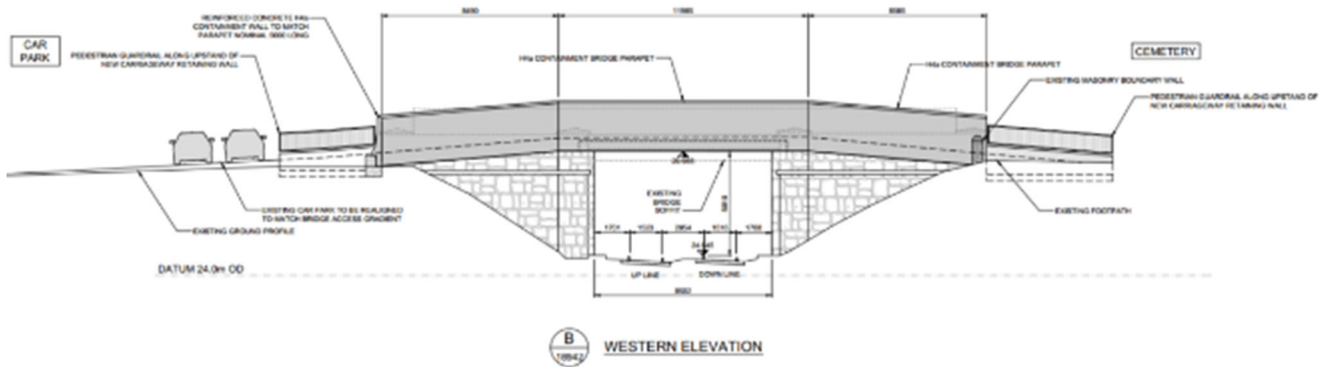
Glasnevin Cemetery Road Bridge (OBO10) Longitudinal Section – Facing East
